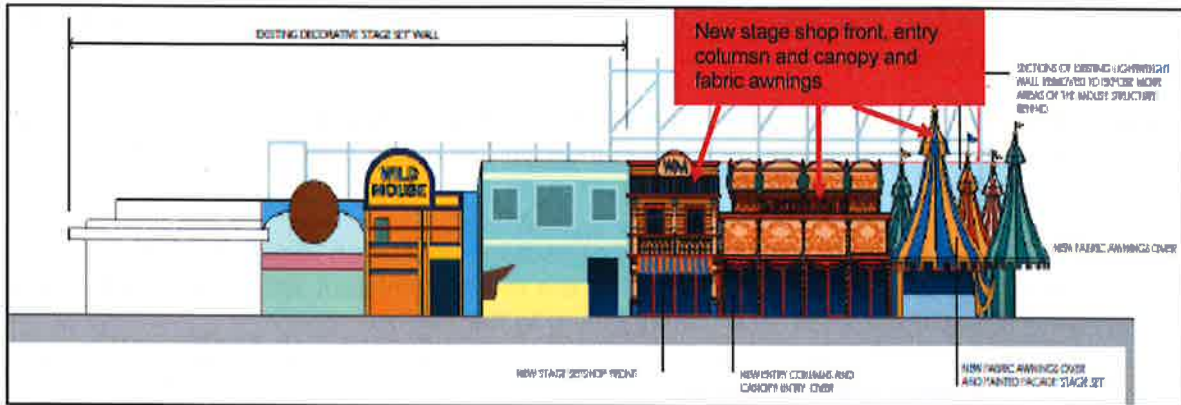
Proposed eastern façade (view is from the Midway) (Source: Applicant’s architectural drawings)
